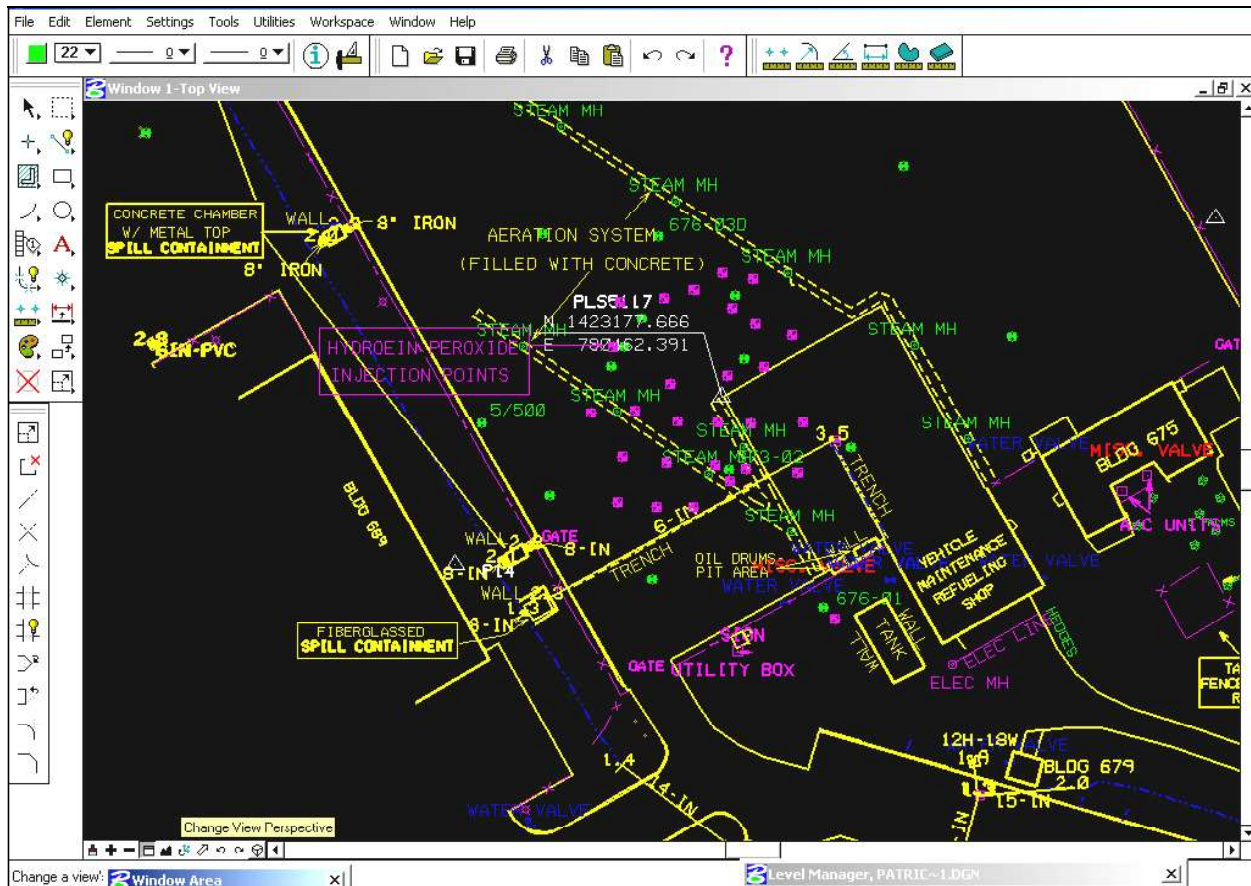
Utilities near a Vehicle Maintenance Refueling Facility at Patrick Air Force Base, Florida (Louisville District--2004)
